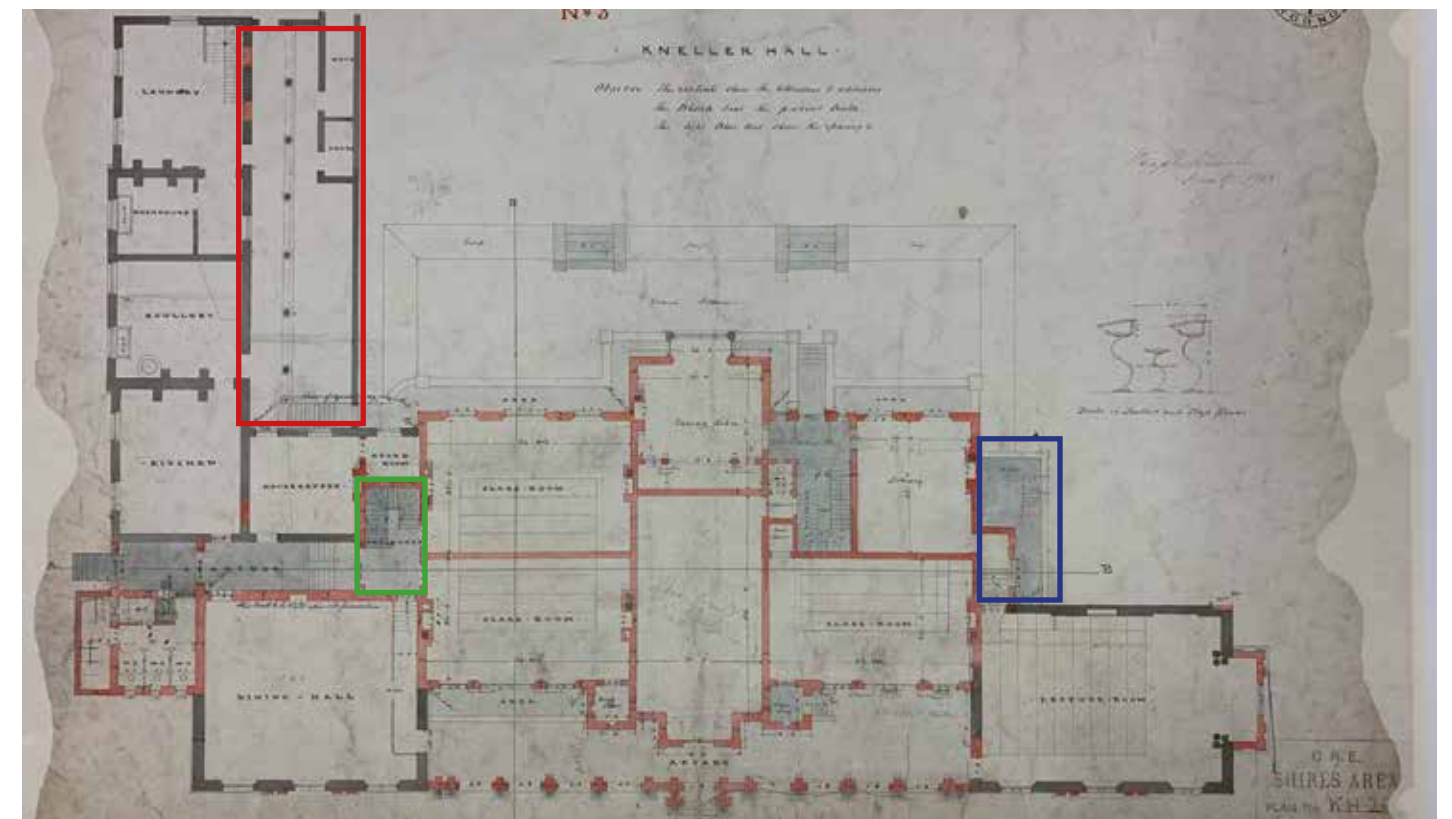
1844 proposed ground floor plan of Kneller Hall, partially realised (black showing the existing building and red showing the proposal). Red = 'covered way', Green = west staircase, Blue = 1844 terrace, replaced by existing east staircase. By George Mair.
